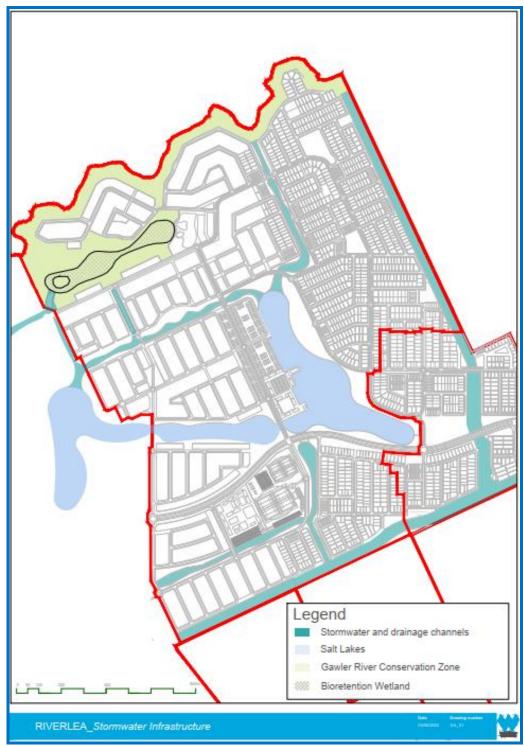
High-Level Stormwater Management and Floodwater Mitigation Plan
